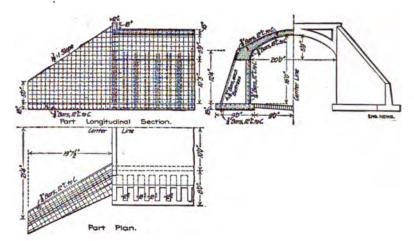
Reinforced Concrete Arch Culvert, Great Northern Railway.
